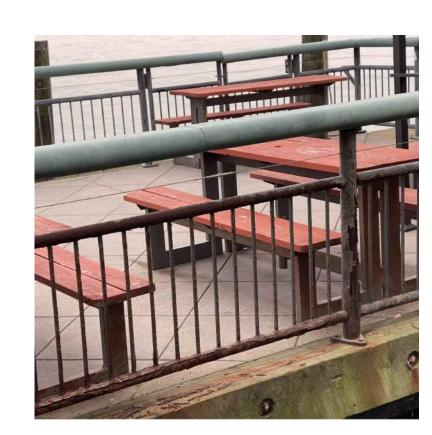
OPEN AREA #6 DETERIORATED HANDRAIL
